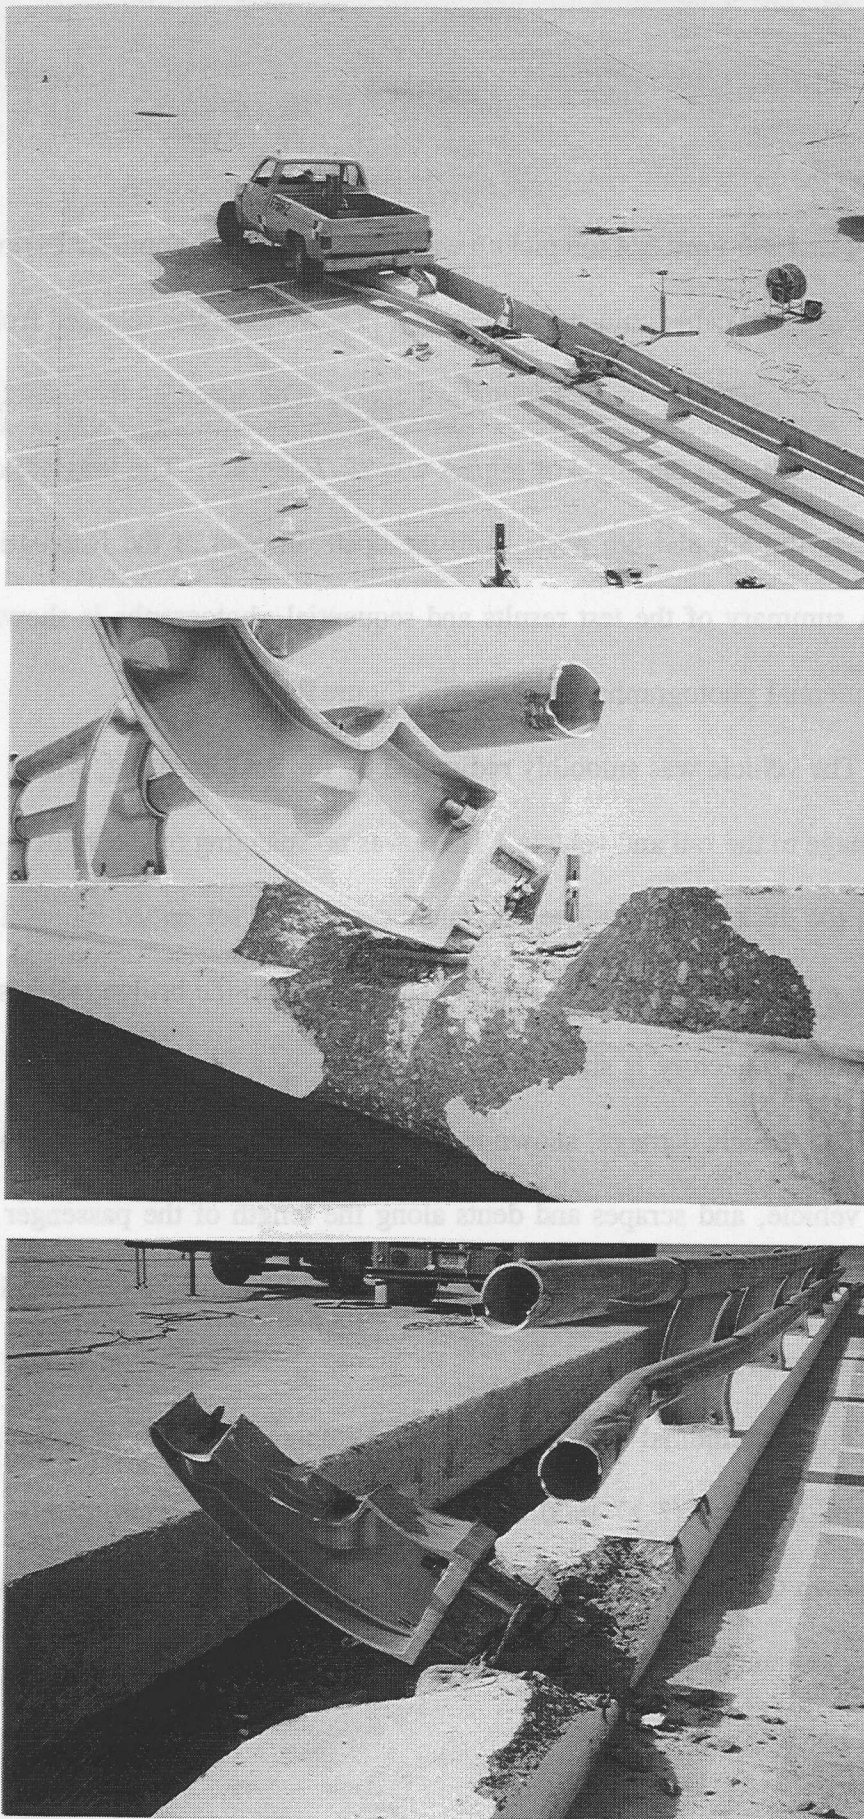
Bridge Rail Damage, Test FPAR-2
